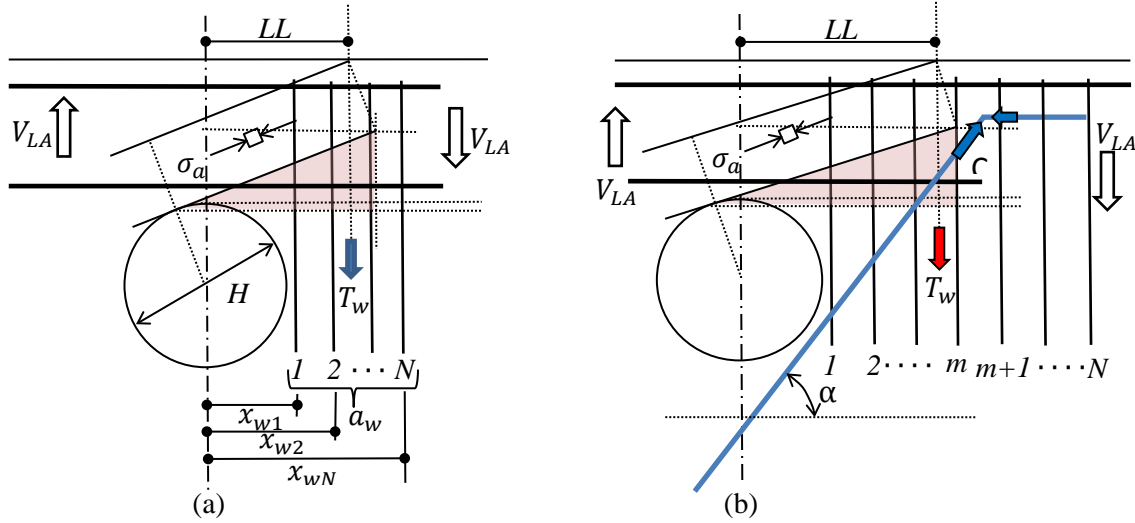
Stirrups that balance with the concrete strut of the local arch mechanism
